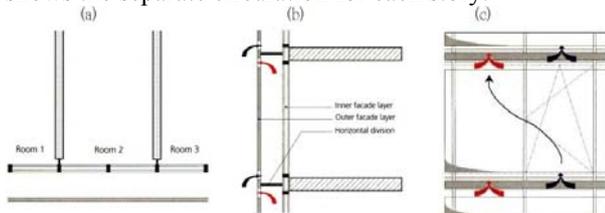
Corridor facade: plan (a); section (b) and elevation (c) (Osterle, 2001)
